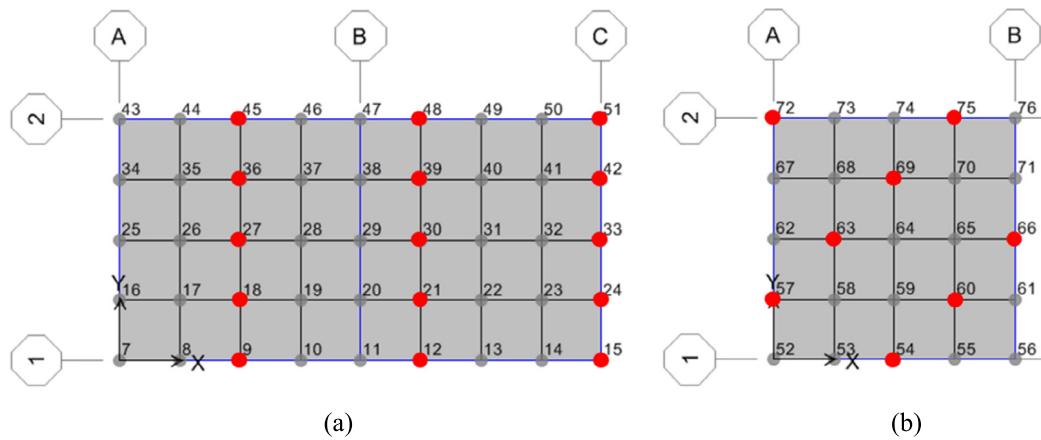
Sensor layout on 3D two-story full-scale building: (a) first floor; (b) second floor.
